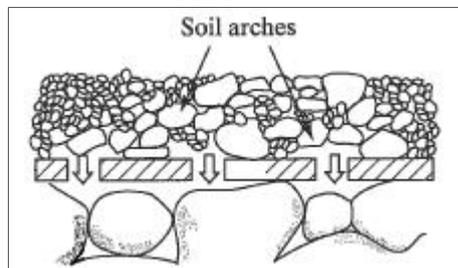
Upstream soil particles forming vaults or arches over geotextile openings
